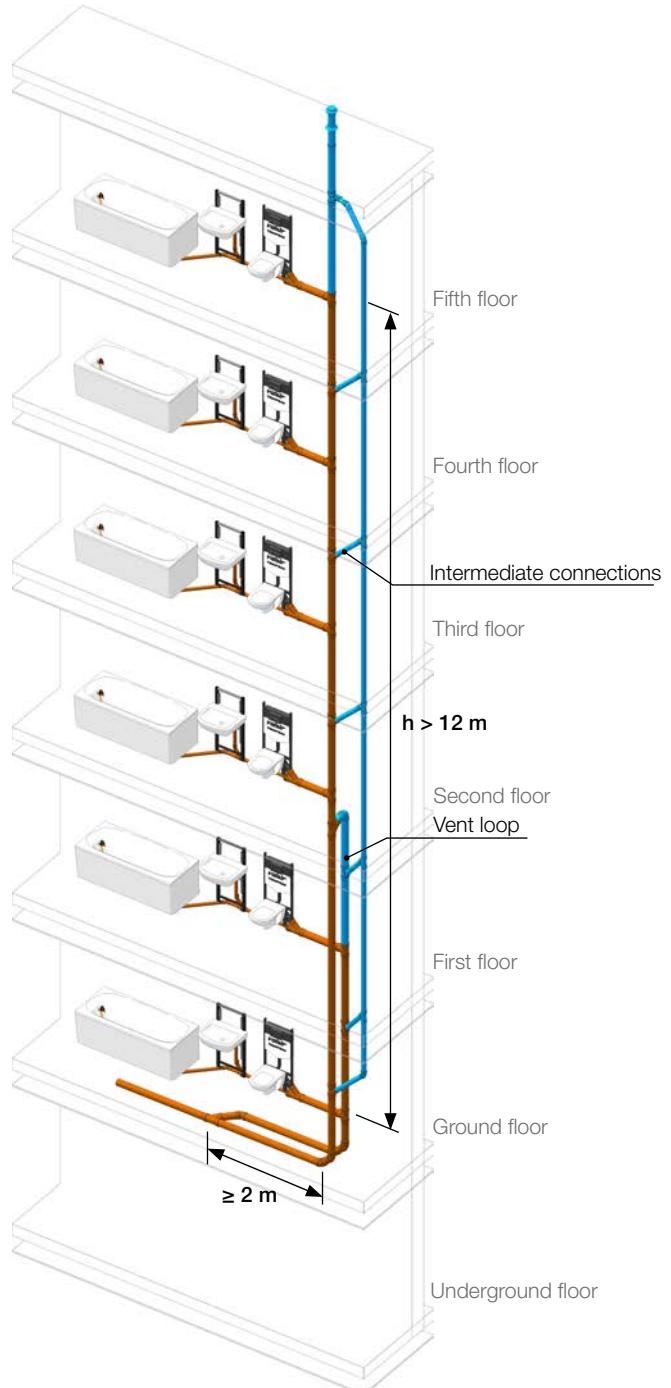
Direct parallel vent, building with over 5 floors ($h > 12 \text{ m}$), collector in the ceiling of the underground floor.
